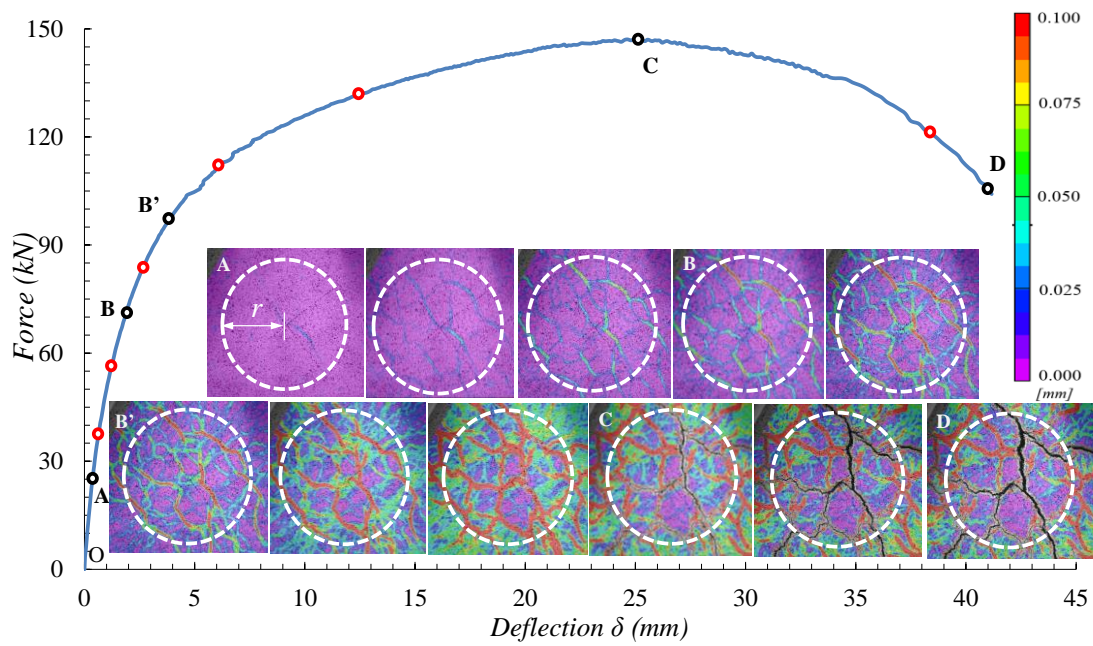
Example of cracking and fracture process on the tensile surface of the UHPFRC slab under quasi-static ring-on-ring testing (S3)
